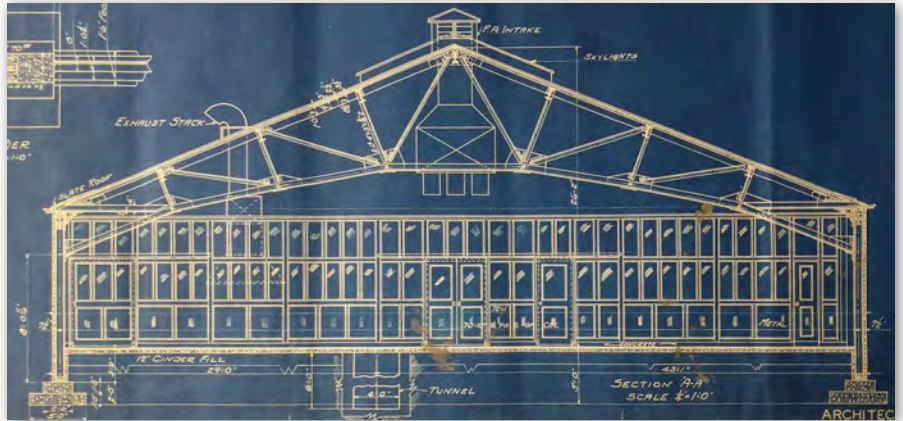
Section drawing through the Dining Hall, showing the configuration of a typical steel roof truss. Beyond is a glass partition design by Charles and Edward Stotz, Jr. (removed ca. 1984) (SCI-Pittsburgh Facilities Archive).
